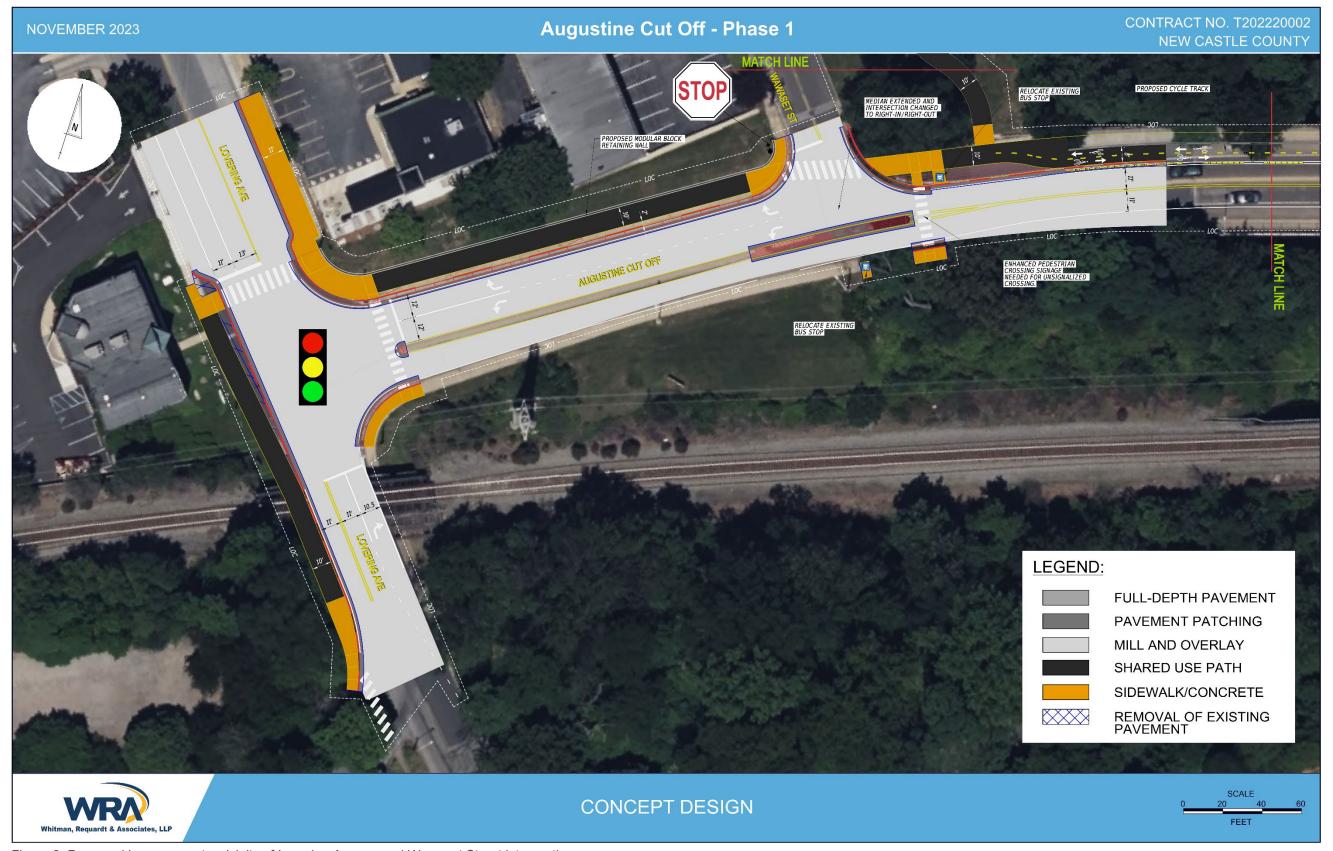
Proposed improvements, vicinity of Lovering Avenue and Wawaset Street intersections
